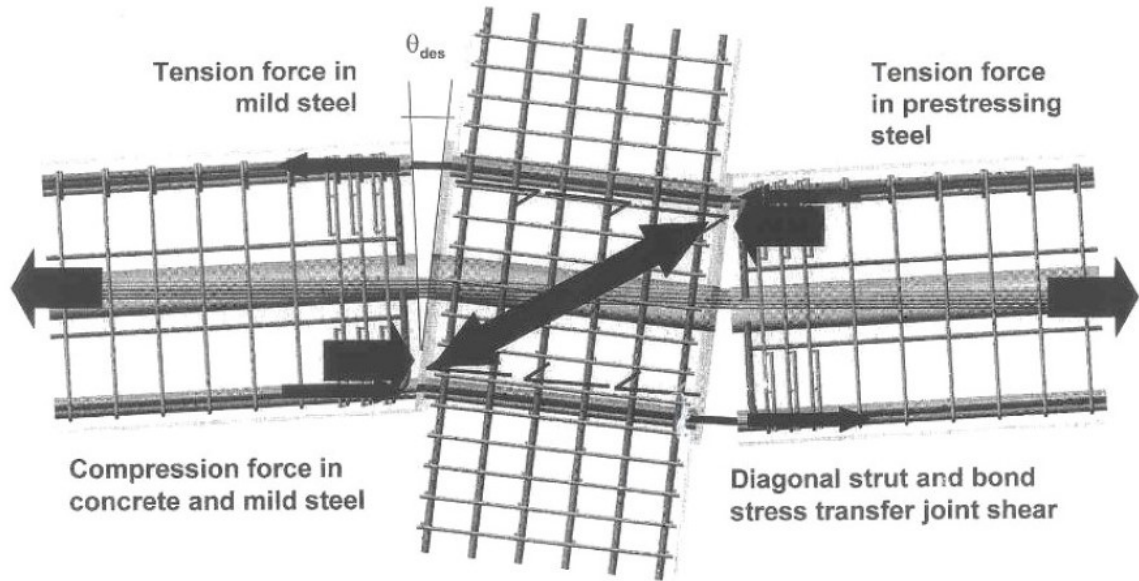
Precast Post-Tensioned Concrete Frame Joint [5].
